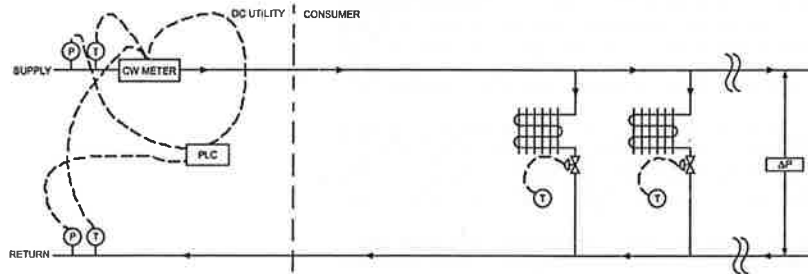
Direct Connection of Building System to District Chilled Water Without Building Pumps
